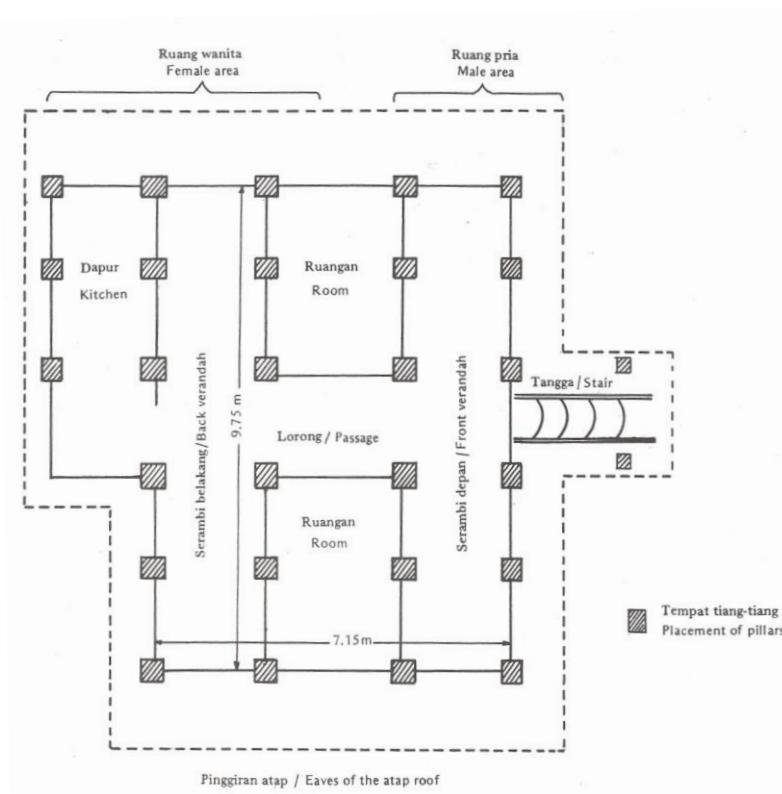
5 Floor plan for a traditional Acehnese house (Hurgronje cited in Leigh and Kerajinan 1989, p.70).
